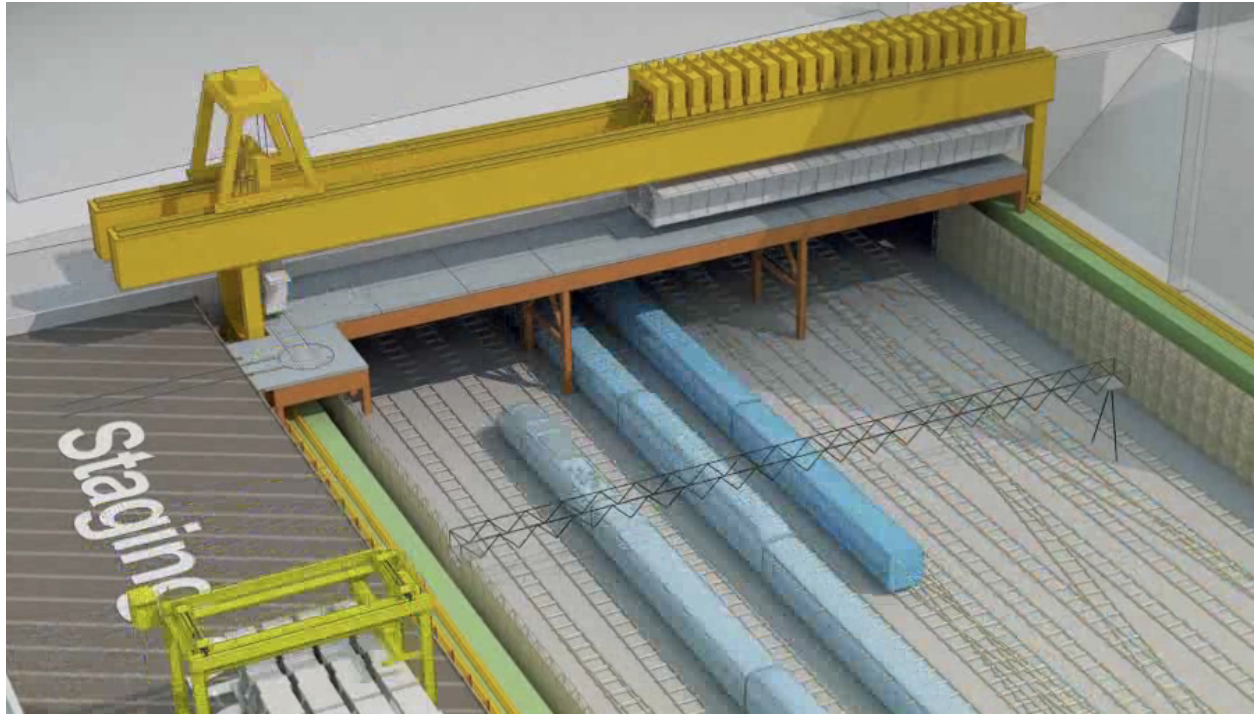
Precast Concrete Segments Placed Together by Launcher for Manhattan West Project Platform (Manhattan West, 2016)
